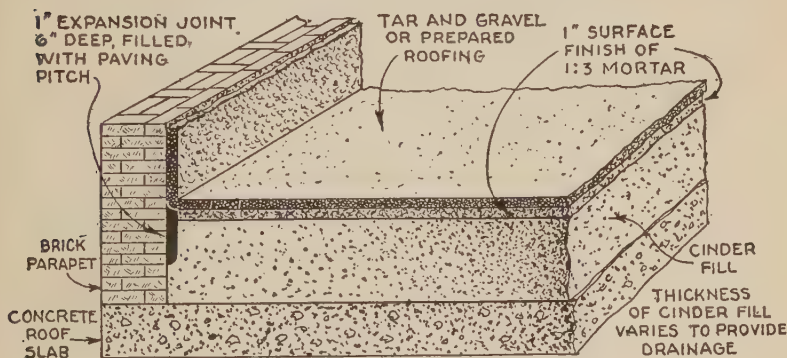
,265.—Cinder fill on concrete roof slab for drainage.
